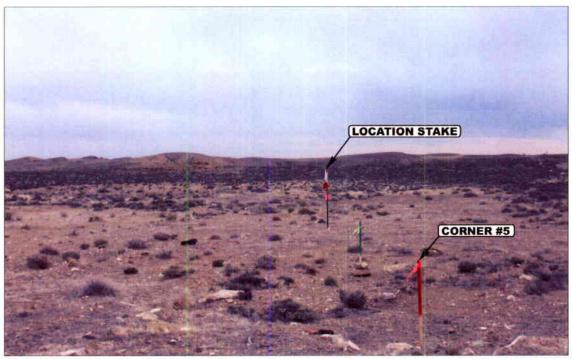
PHOTO: VIEW FROM CORNER #5 TO LOCATION STAKE
